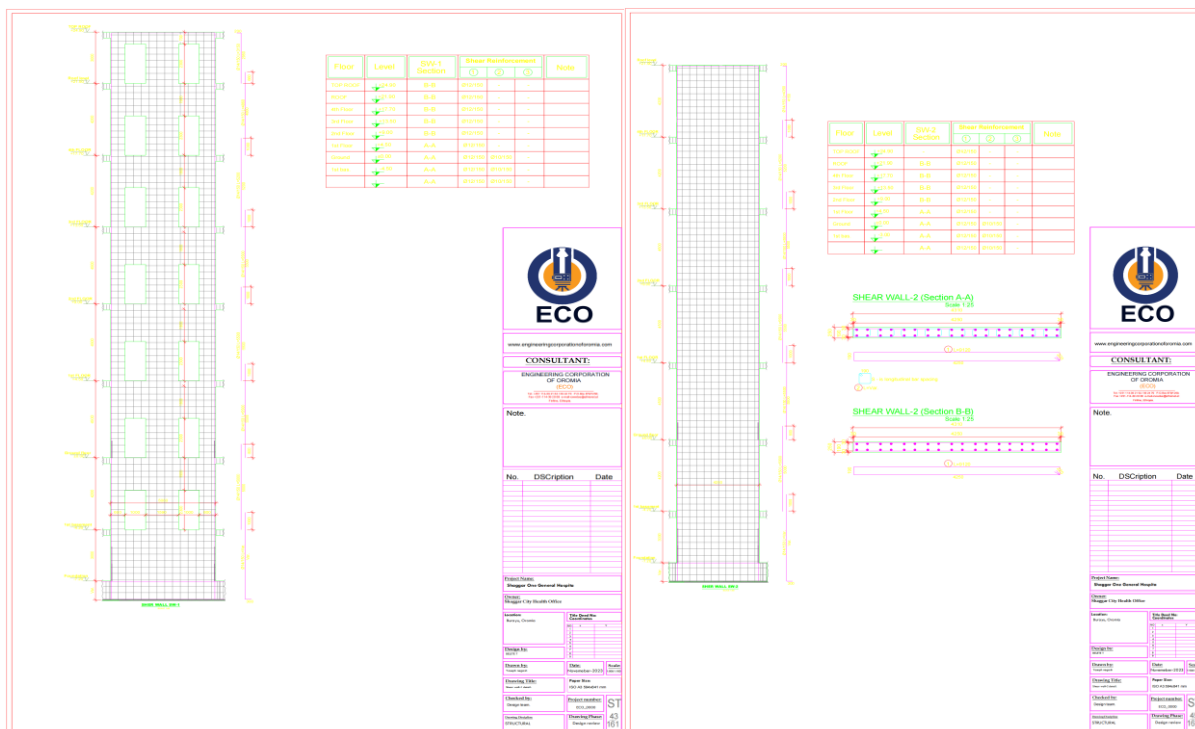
Typical Shear Wall (SW-1 & SW-2) Layout, Reinforcement, and Connection Details.
